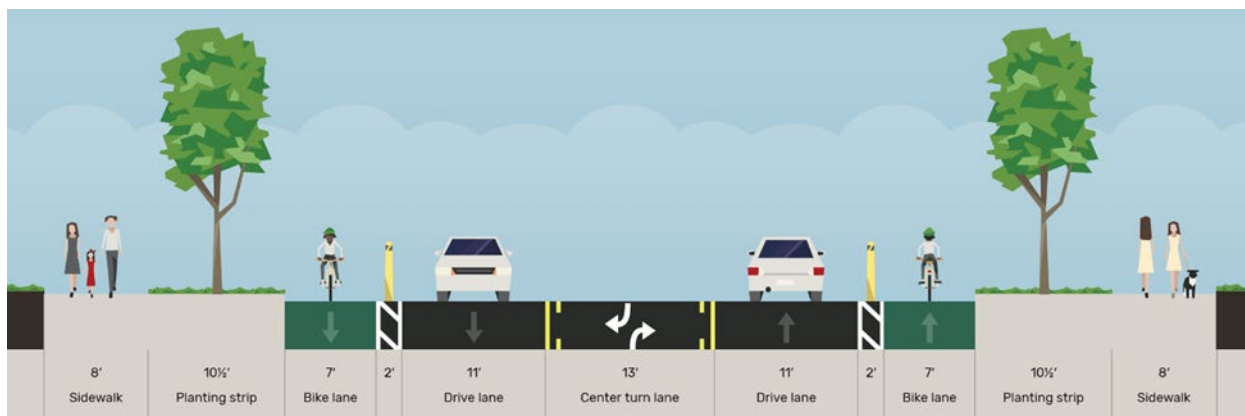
Cross section diagram of design recommendations with bike lanes and no on-street parking (assuming 90’ from outside of sidewalk to outside of sidewalk).
